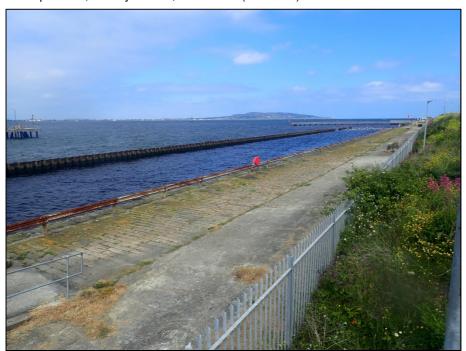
Northeast-facing view of the surface of the sea-wall with adjacent sheet-pile wall located 22m to the north; Survey Area 4, GSW-east (1m scale).
